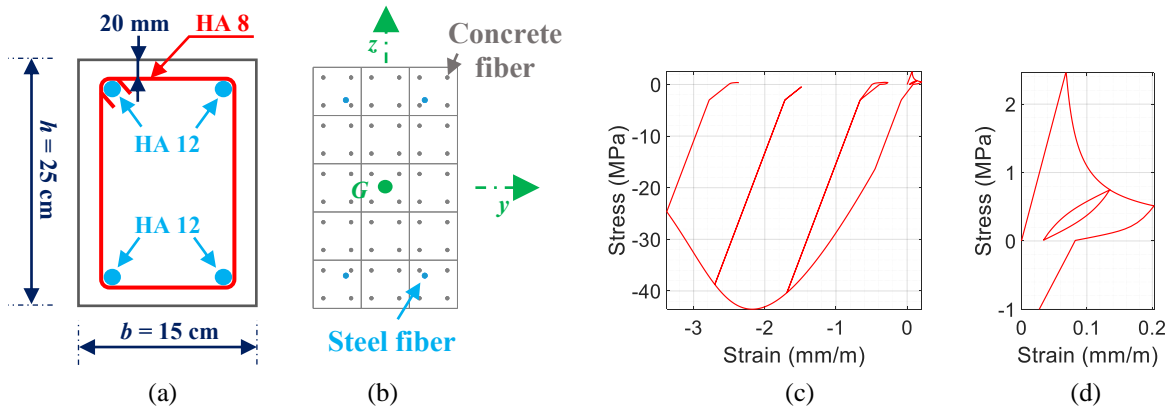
Steel reinforcements (a) and mesh (b) of the beam cross-sections, and uniaxial damage law for concrete with opening/closing of cracks (c) and frictional sliding (d).
